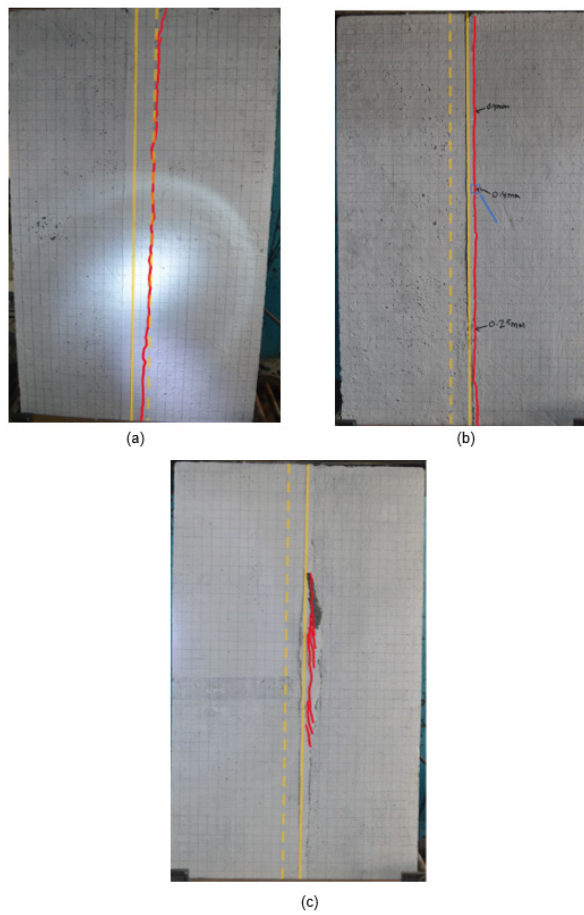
Crack pattern of the Type 2 wall-to-wall connection for specimens (a) T2S1 (b) T2S2 and (c) T2S3
